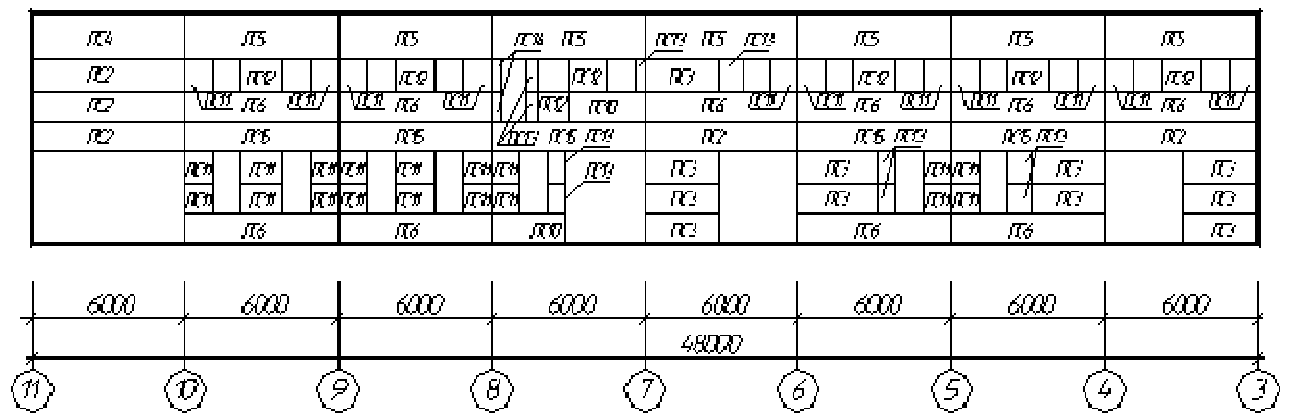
The scheme of arrangement of wall panels on an axisB.
